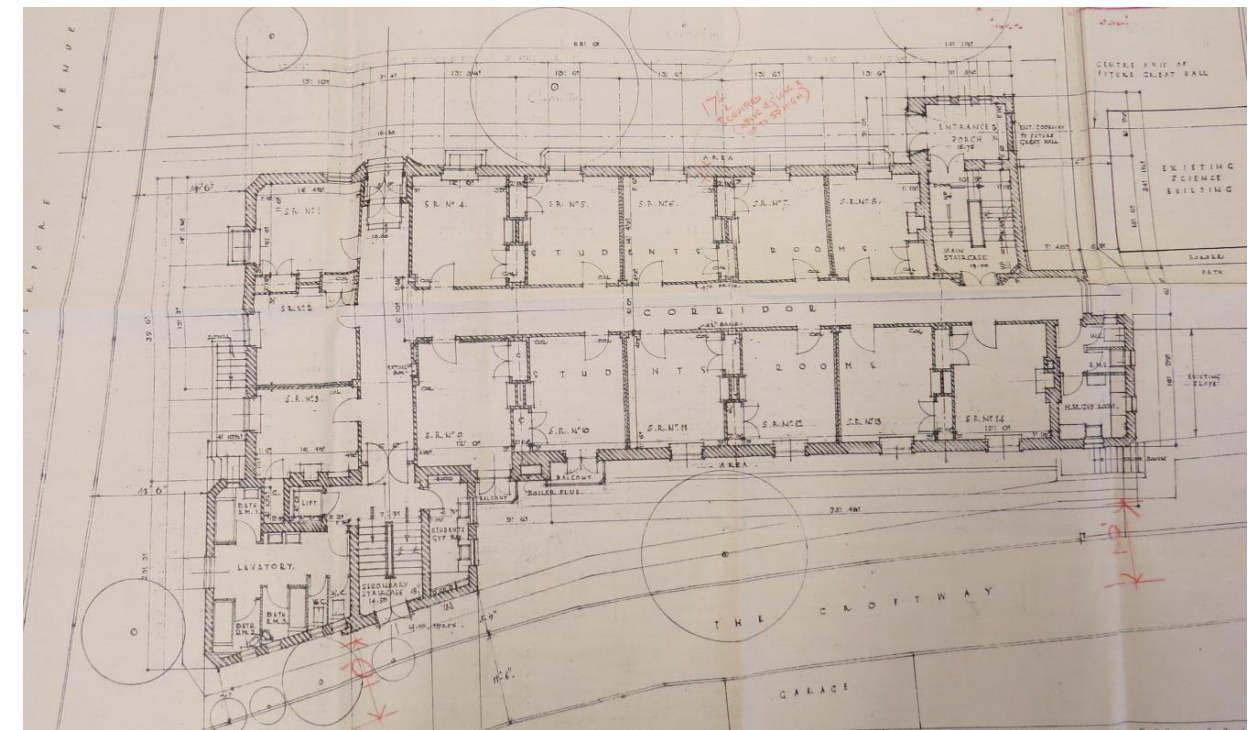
The Ground floor plan produced for the new Lord Cameron Hall in 1934.
